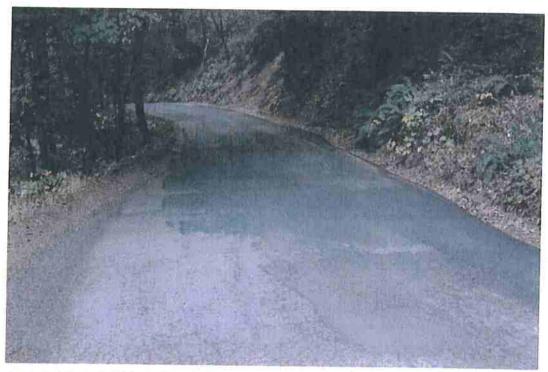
Mile 0.3: 18-ft road width with 1-ft shoulders.
